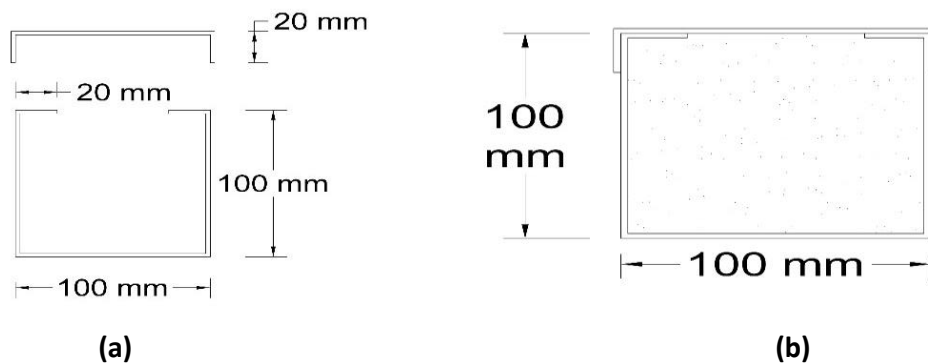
Composite beam cross-section; (a) steel tube; (b) composite beam.
